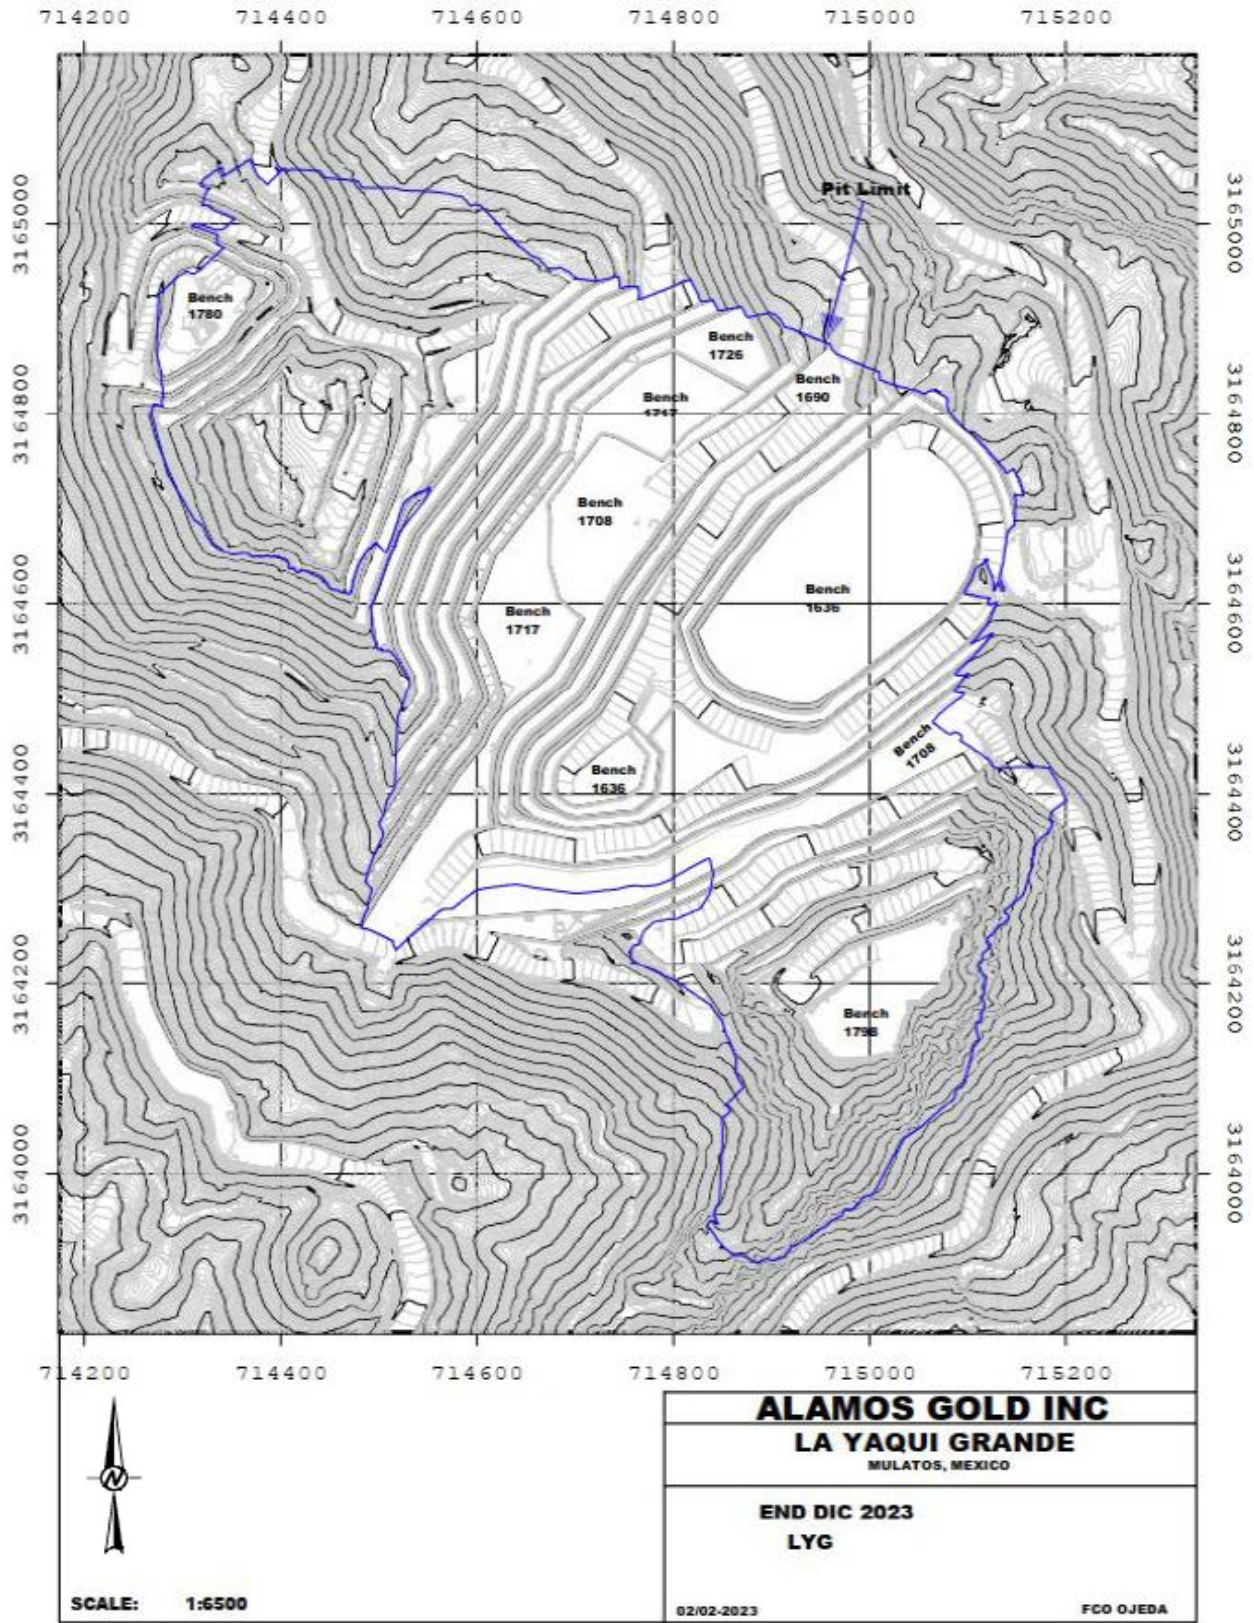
La Yaqui Grande Pit Plan, End of 2023
